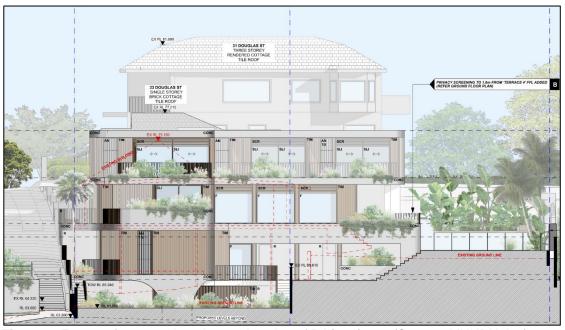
Extract of proposed northeast elevation of DA/562/2021 (Source: MHNDUnion).
